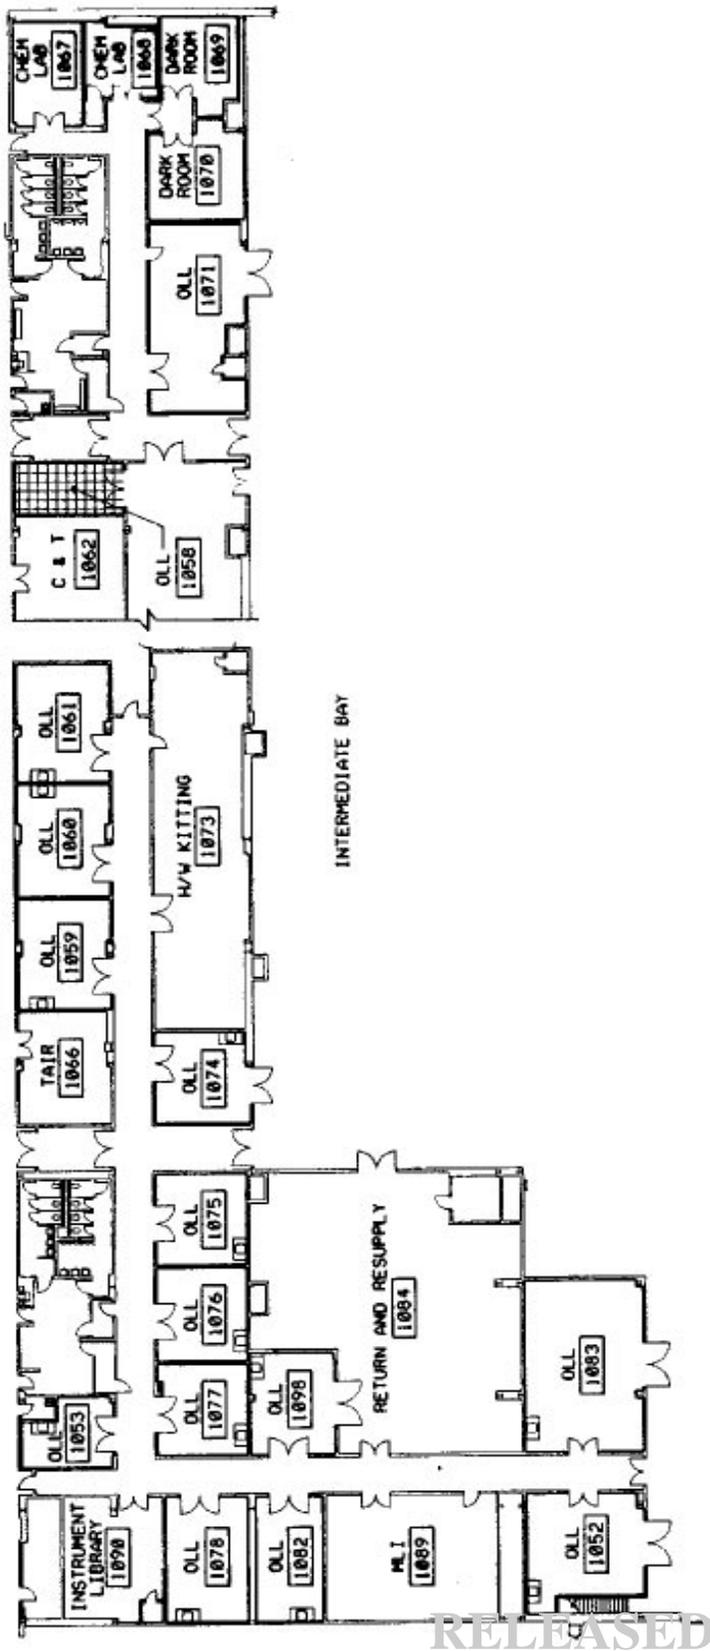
Layout of Off-Line Laboratories, First Floor
